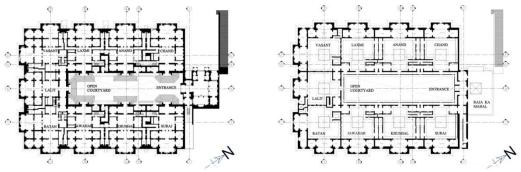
& 3.2: Madhavendra Palace- Ground floor plan & First floor plan
